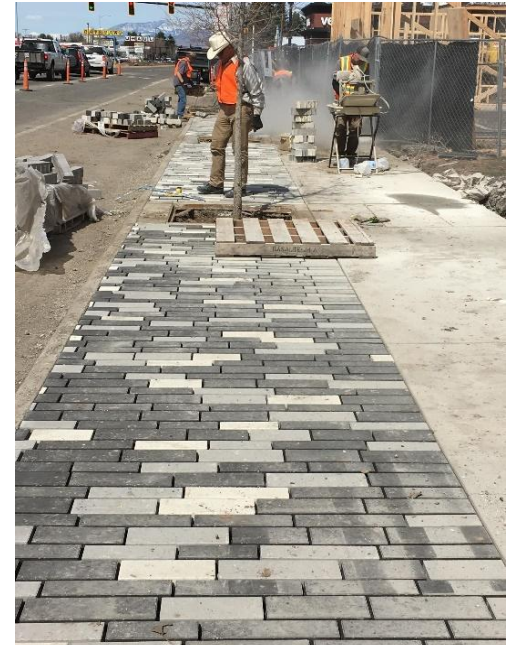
Permeable paver installation along N 7th Avenue, Bozeman MT. Source: City of Bozeman Stormwater Division, 2018.
